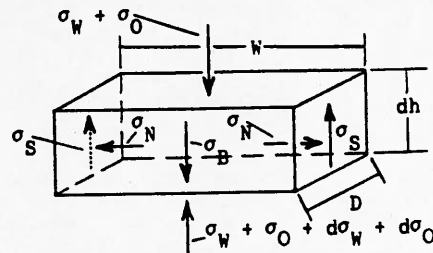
Forces on an Element of Soil-Bentonite Cutoff Wall
